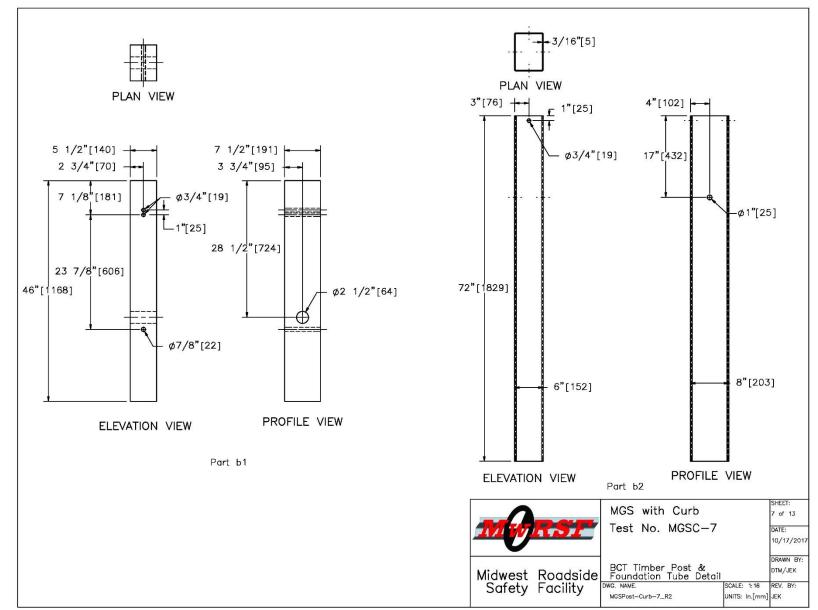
BCT Timber Post and Foundation Tube Detail, Test No. MGSC-7
